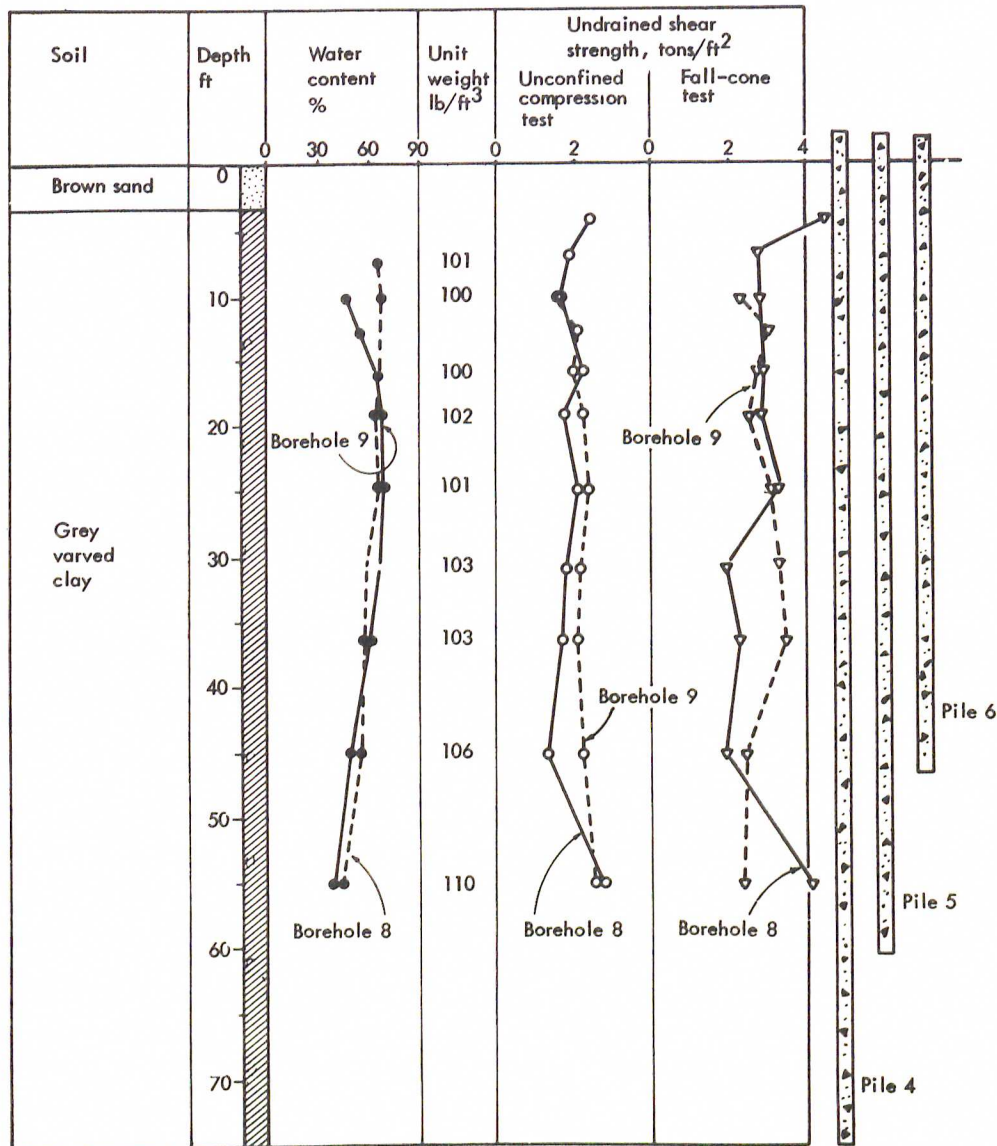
Soil Conditions at Test Site of Piles 4, 5 and 6.
